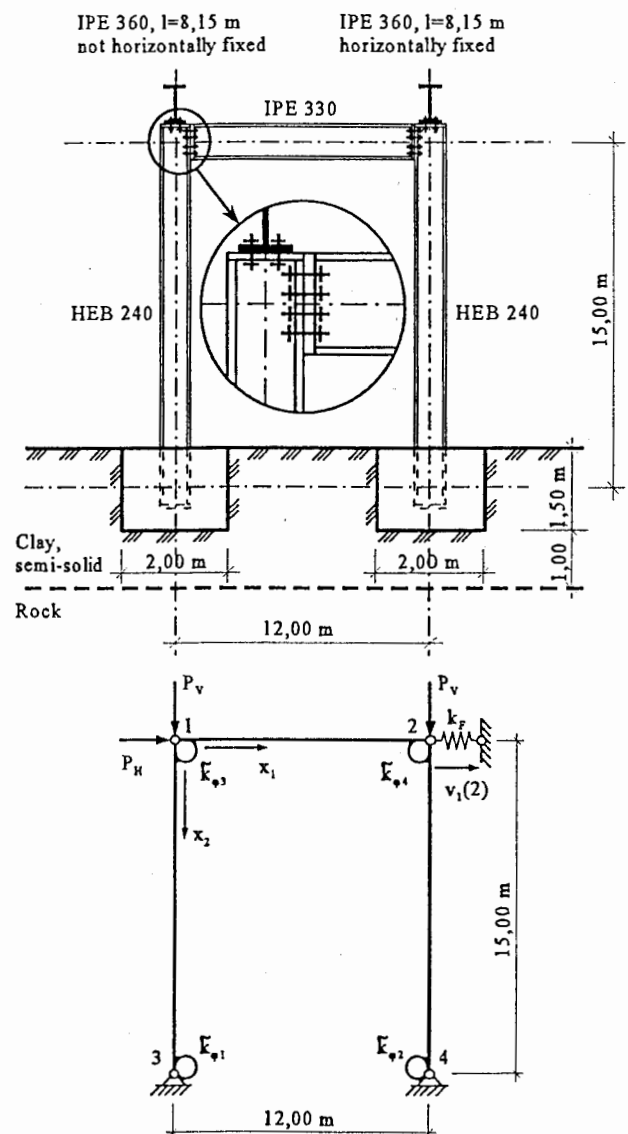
Frame with imprecise rotational restraints, Construction sketch for modeling the static system and load
